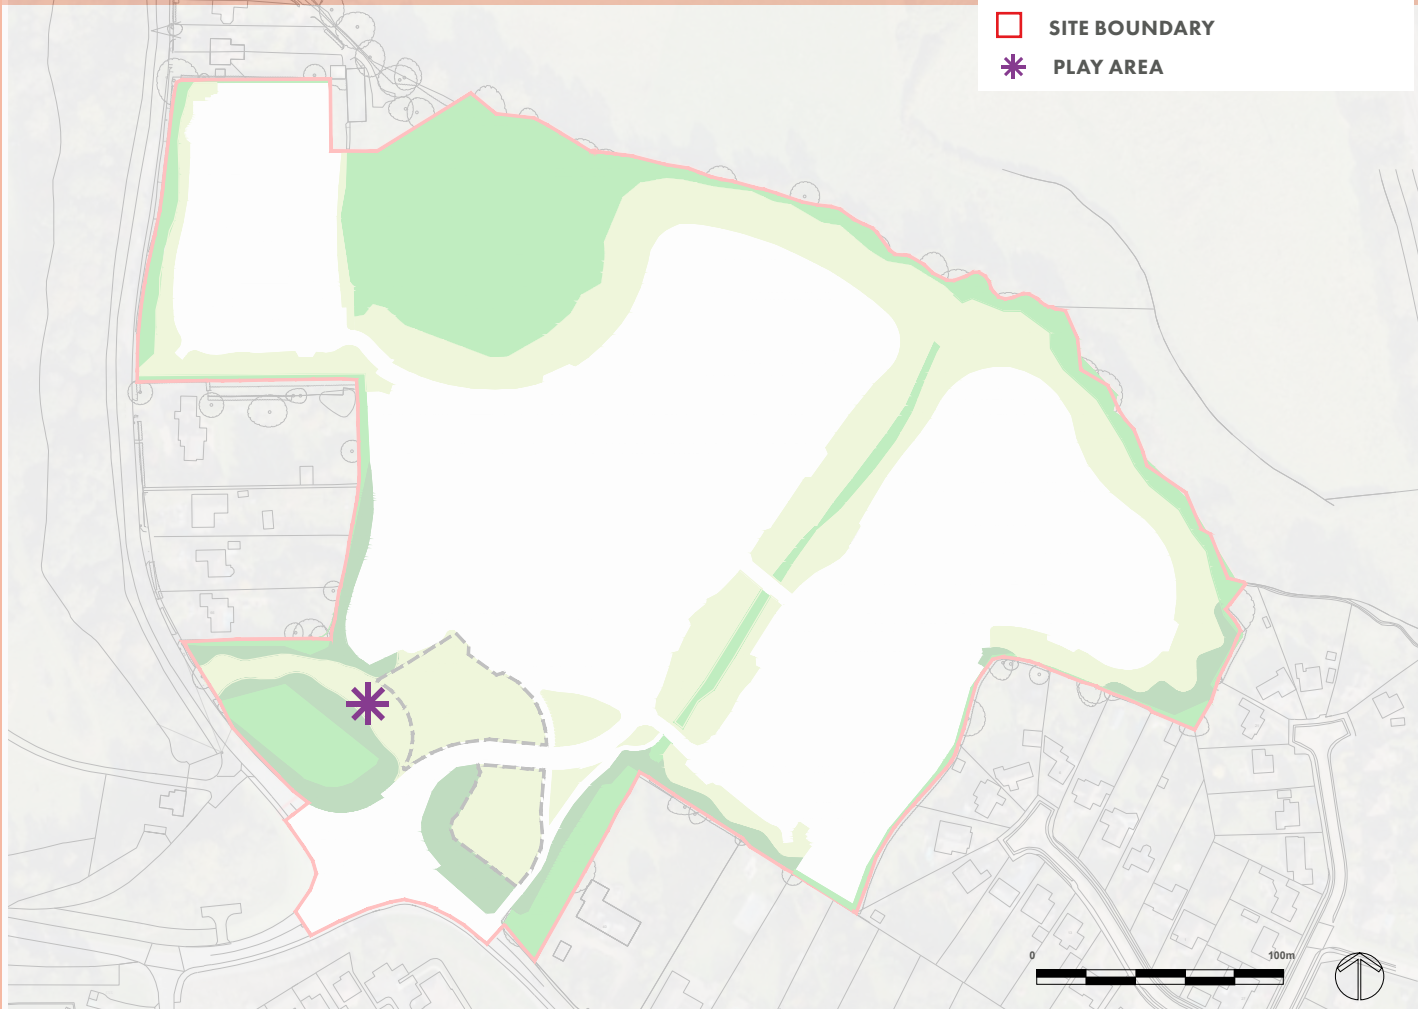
PLAY AREA ILLUSTRATIVE PLAN
